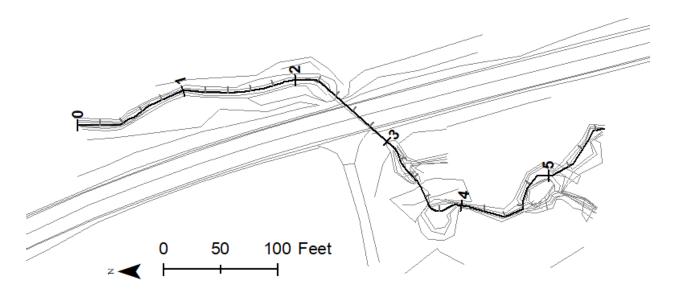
</u>56: Longitudinal profile stationing for existing, natural, and proposed conditions
